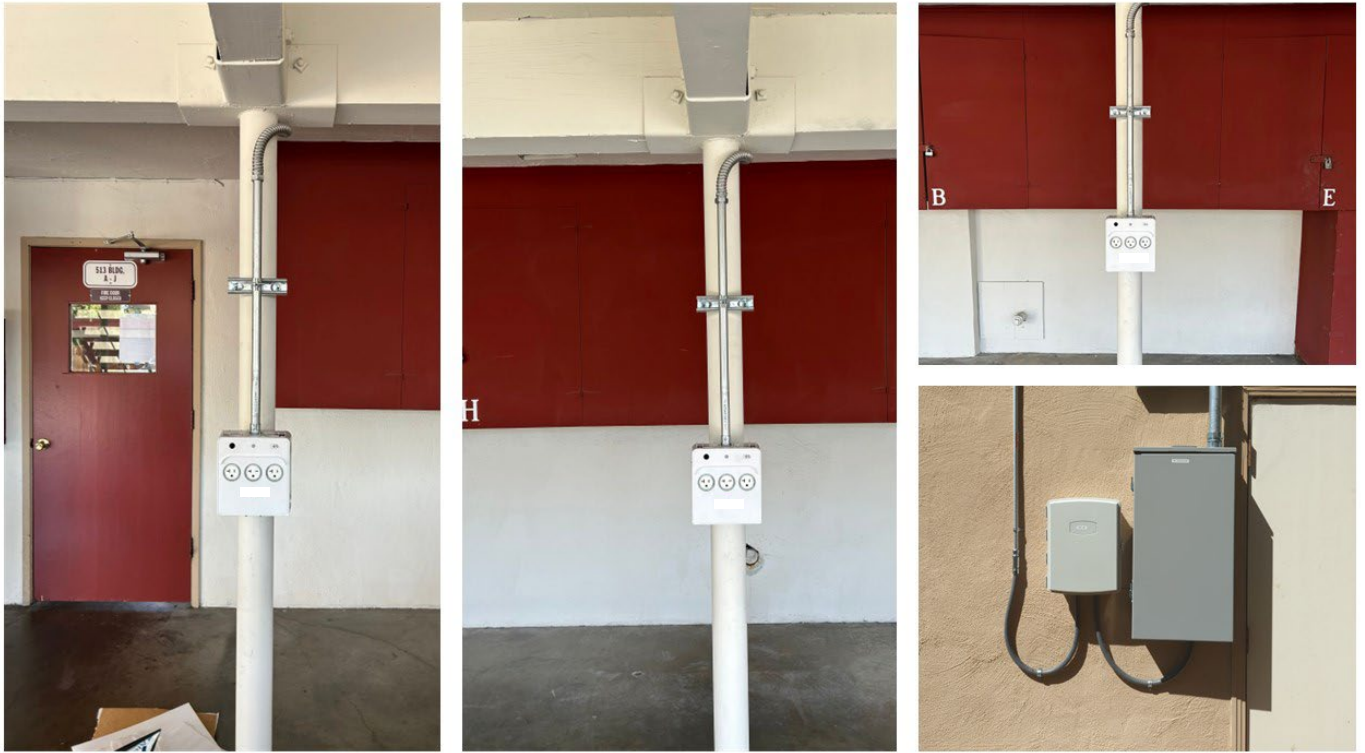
Site 3 chargers installed off the house panel, and the dedicated electrical panel installed by the evaluated technology provider that will be power the full installation once the utility upgrades the building's service.
